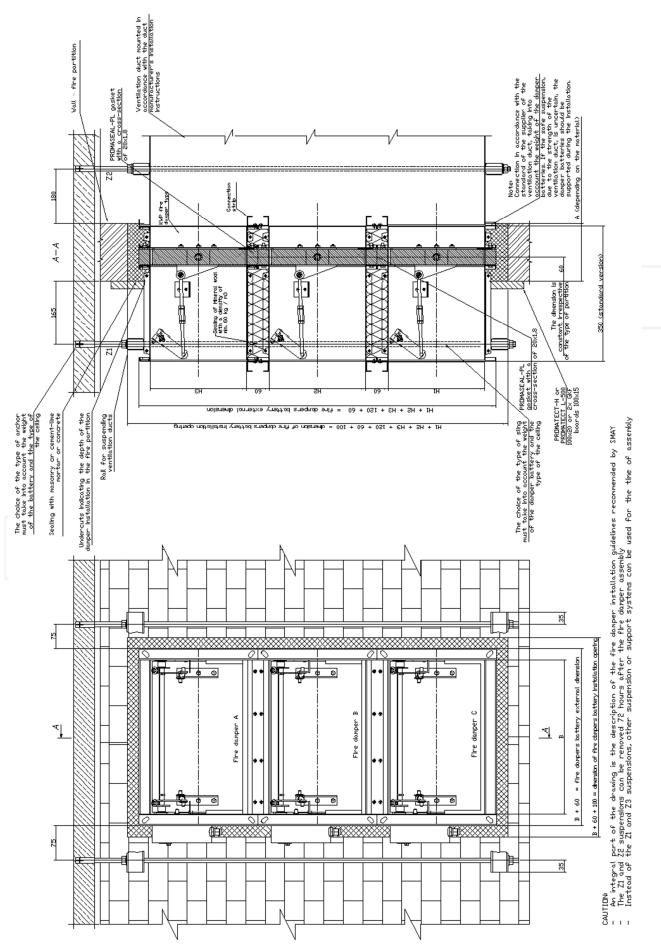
Installation of a battery consisting of three fire dampers KWP in vertical arrangement in wall
